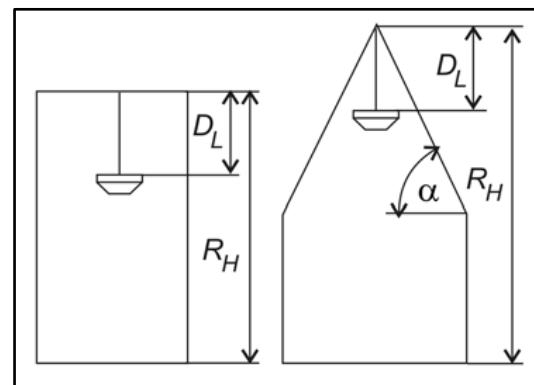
Fire Detectors Arrangement Above Flat Roof And Slope Roof (Figure Source: Fire Protection Systems Designing, Milan Blagojević, Unpublished)
